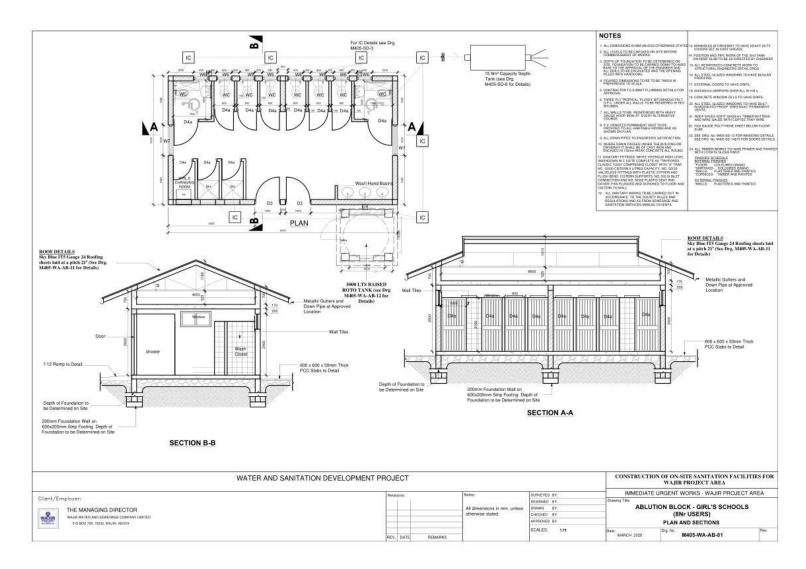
Layout Plan of Proposed Girl Ablution Block
